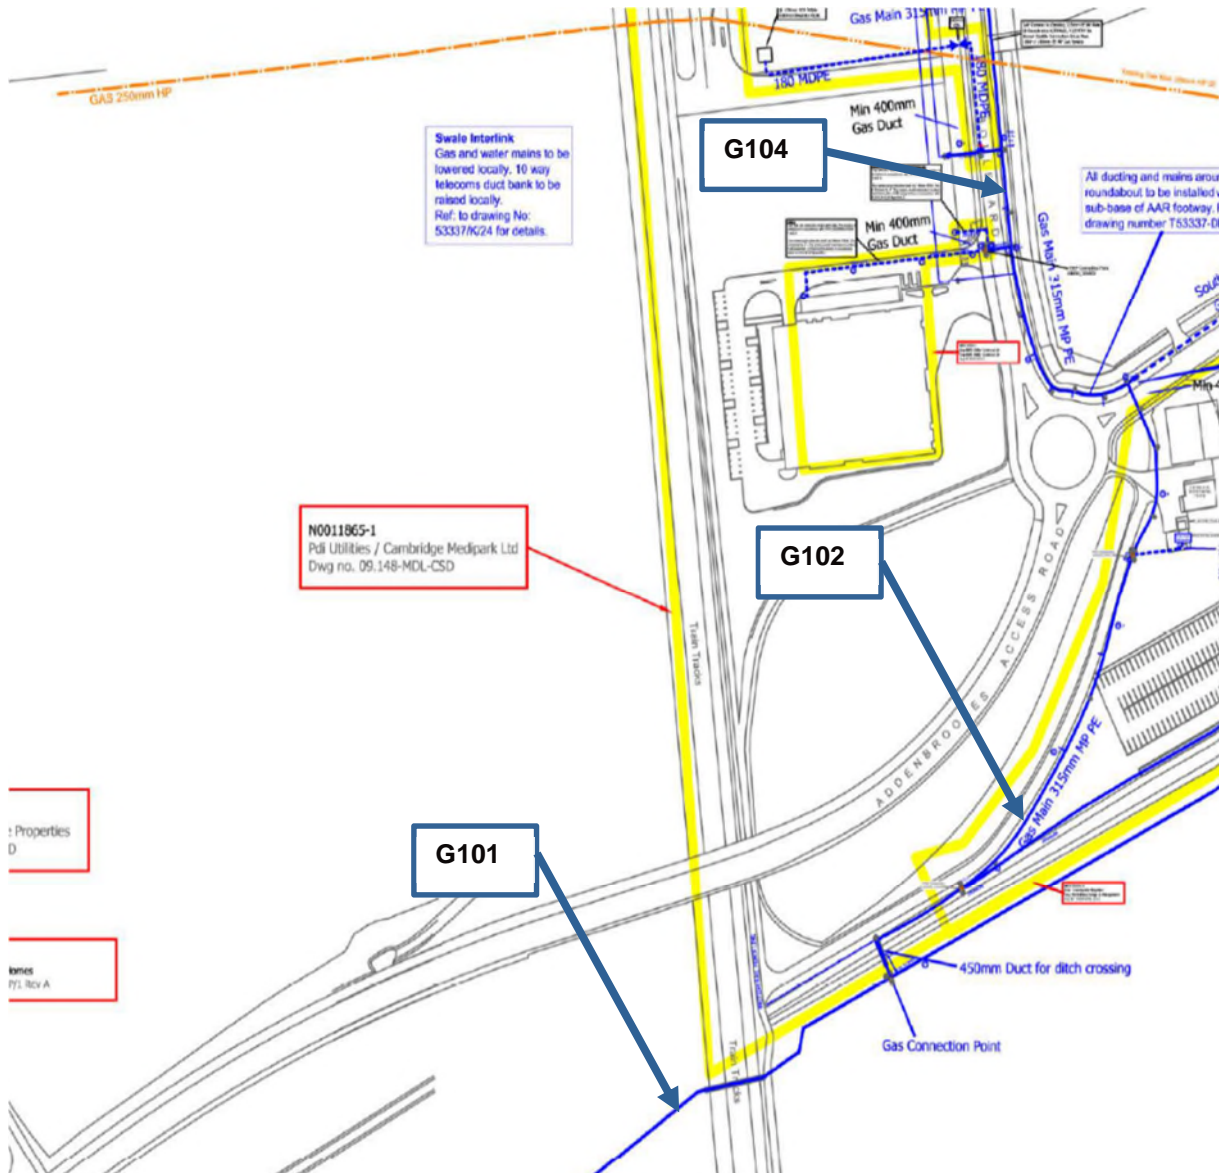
Gas Utility at BGK-1544a Long Road Bridge
